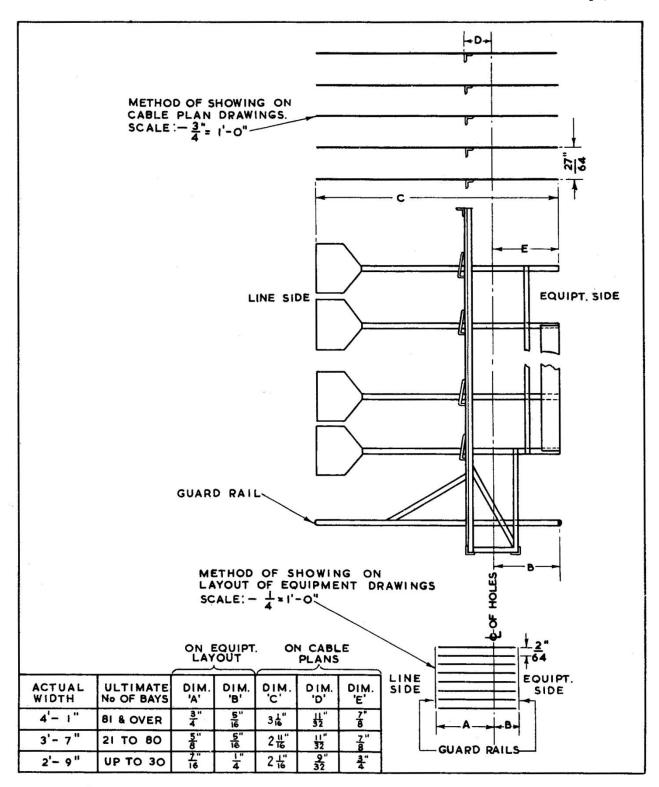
2000 TYPE EQUIPMENT, METHOD OF SHOWING
